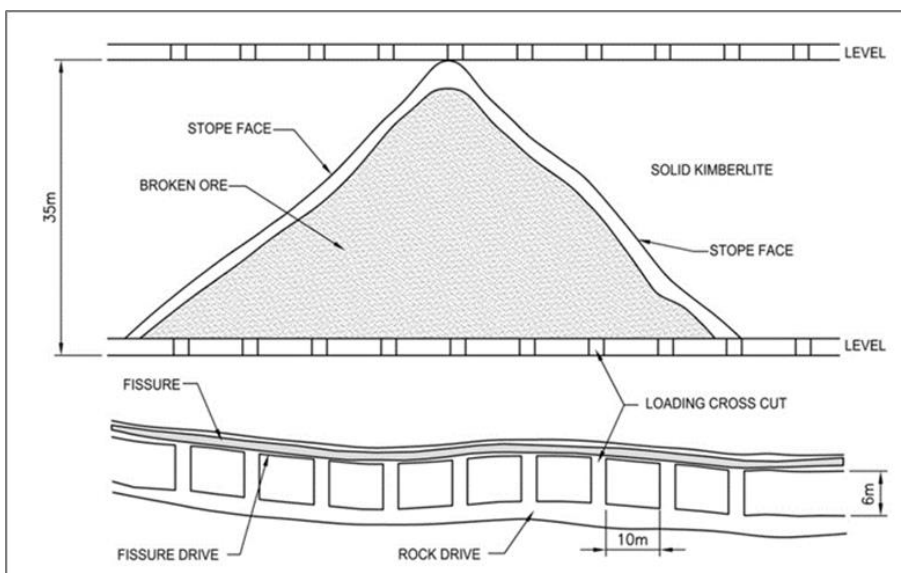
Section view of the Overhand Shrinkage Stopping layout
